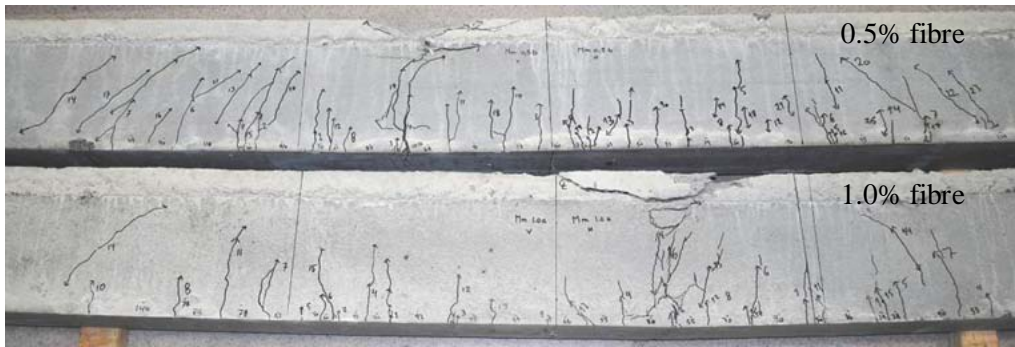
Crack pattern at failure for beams with 0.5% and 1% fibre
